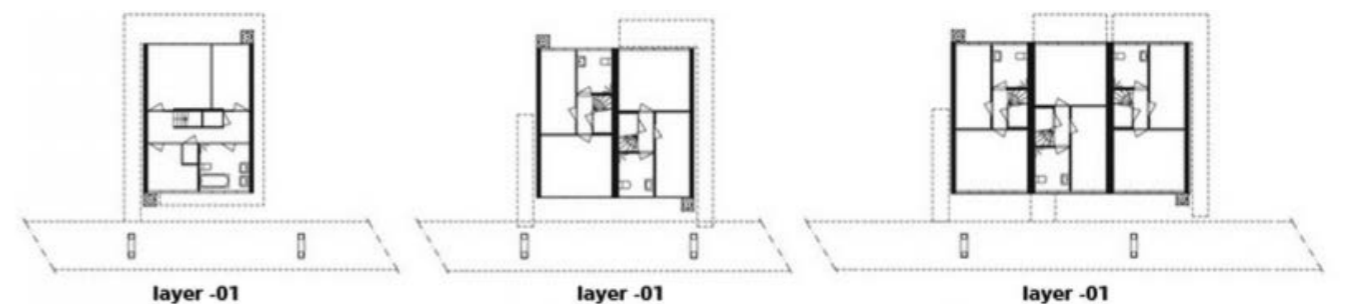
Concrete tank serves as basement that can be reused as storage / bedroom (Waterwoningen ,2015)
